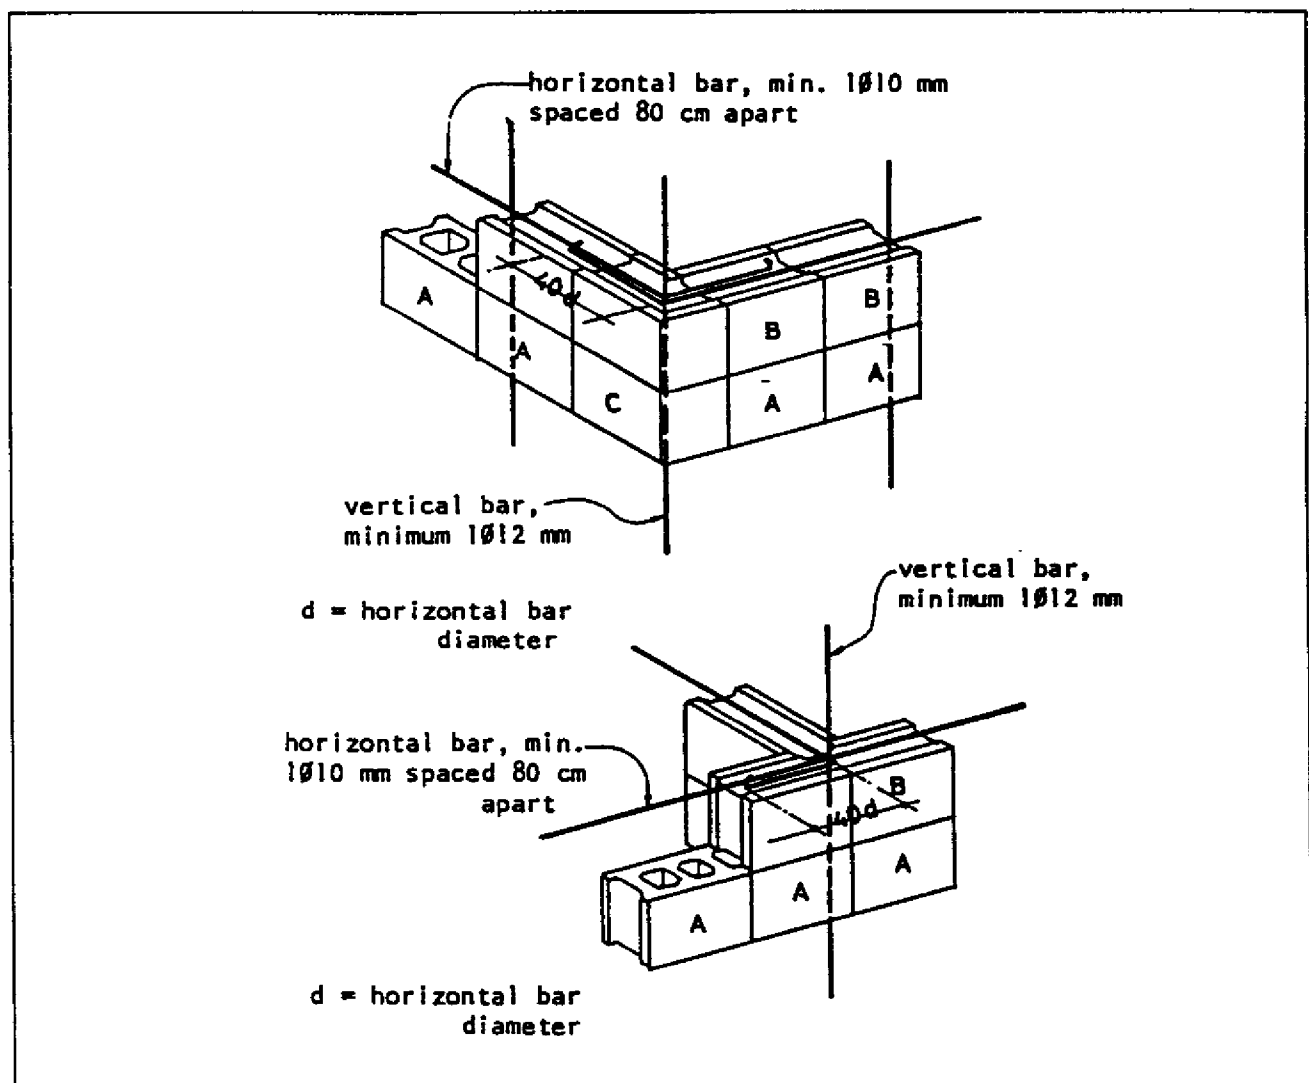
Horizontal Reinforcement in Slightly U-Shaped Blocks [4].
